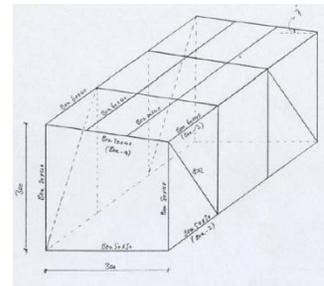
Basic design concept of prefabricated steel structures for temporary houses proposed by HF
